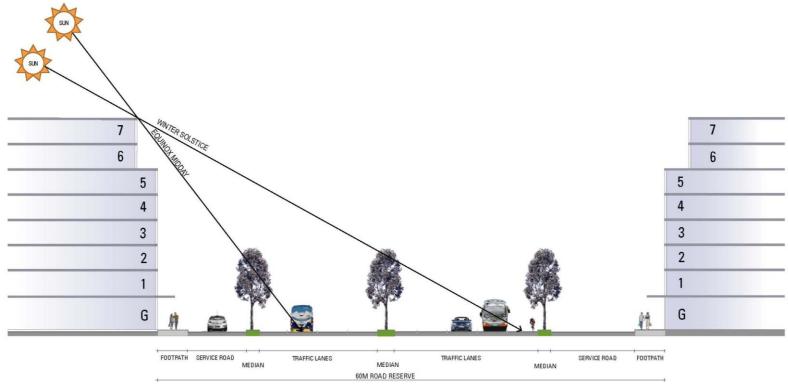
Cross-section through Dandenong Road east of Boardman Street
